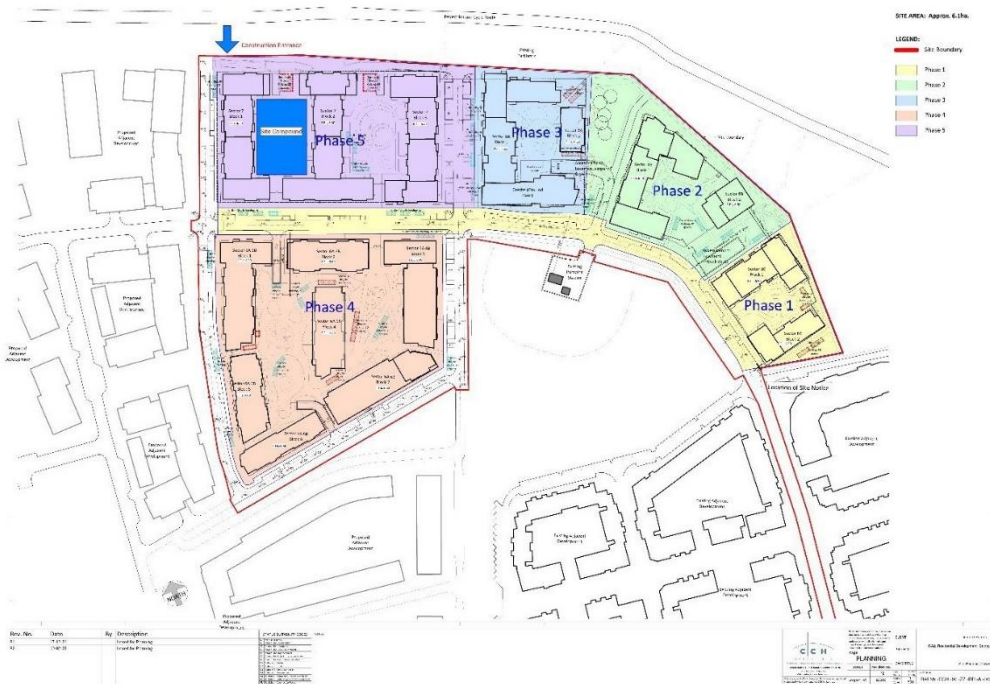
Proposed Site Phasing and Potential Compound & Staff Parking Location Options
